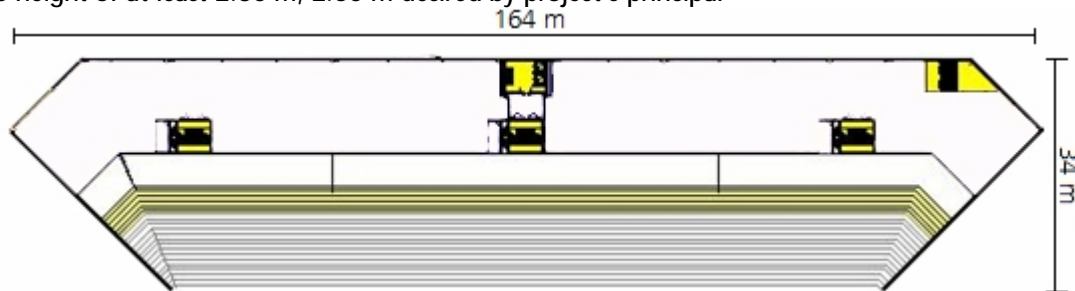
Functional plan for the 1<sup>st</sup> and 2<sup>nd</sup> floor
